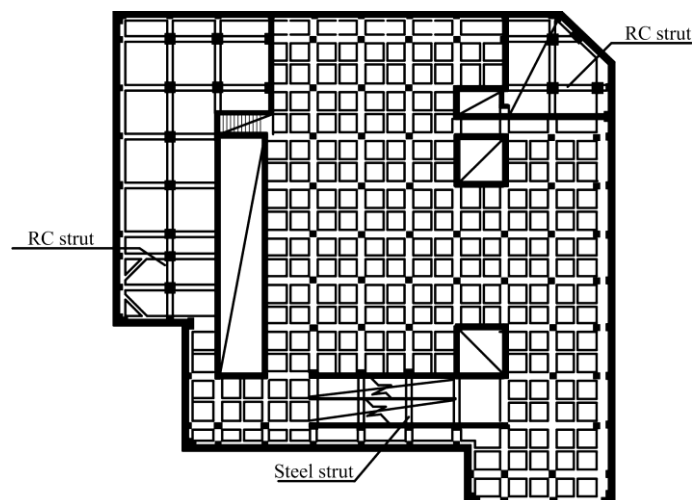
First floor beams and floor slabs (Xu 2007)
